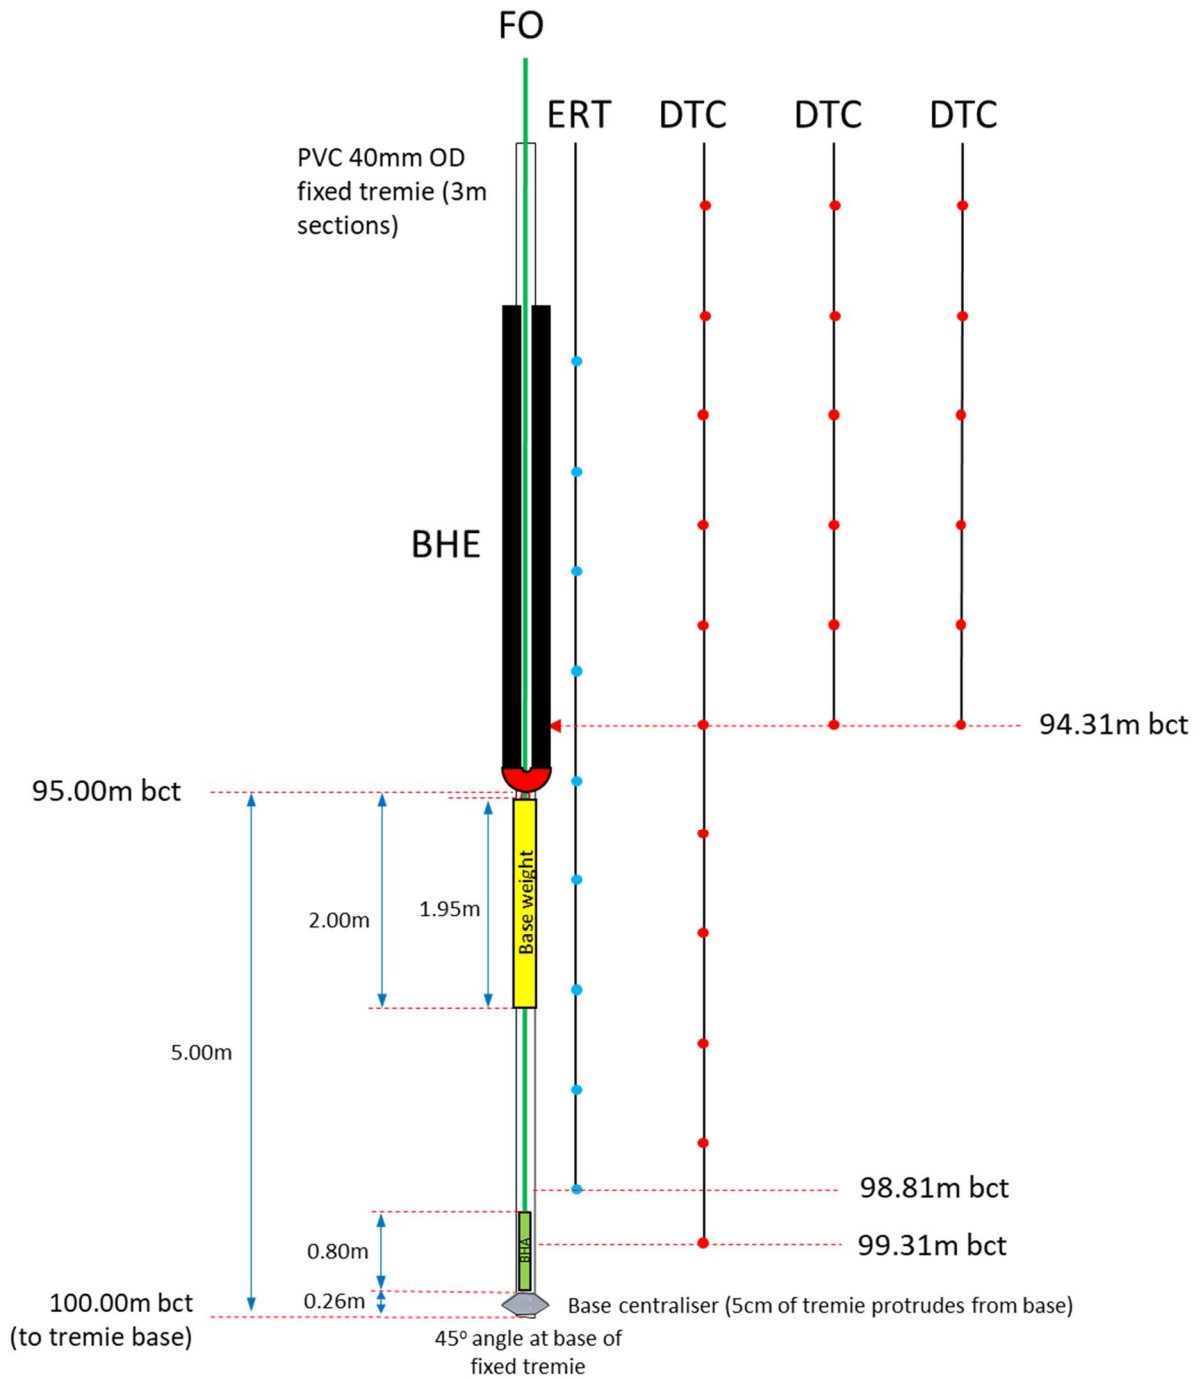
TH0416 bottom hole assembly schematic showing the depth of the install and bottom of each sensor string.
